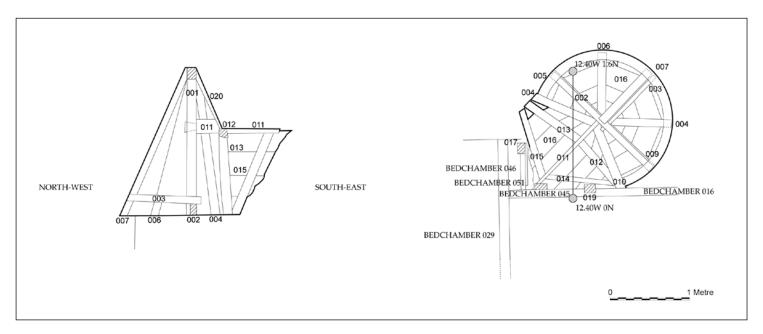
SW Facing Elevation & Underside Plan of W Turret
